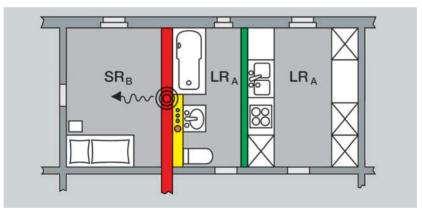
165 Layout that is unfavourable with regard to building acoustics
